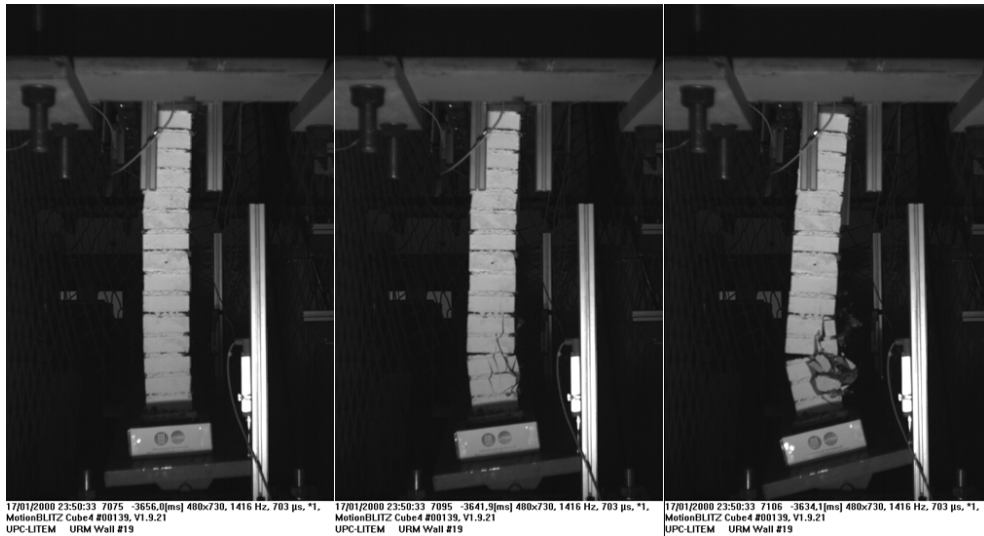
186 Failure of wall W#19. Masonry crushing at the lower part.
